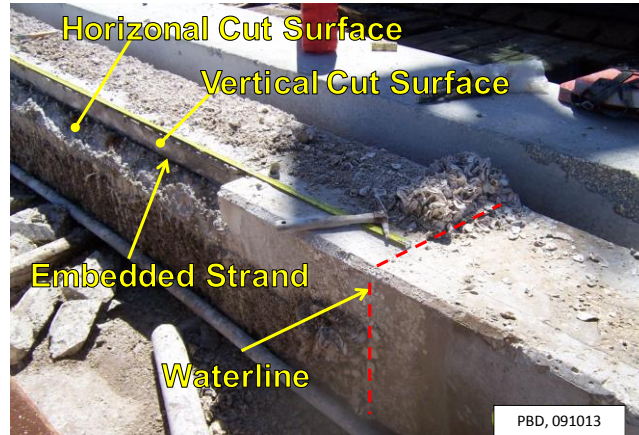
Autopsied Bridge B pile. Note concrete chunks on deck removed from pile with a hammer and chisel after vertical and horizontal saw cuts were made.
